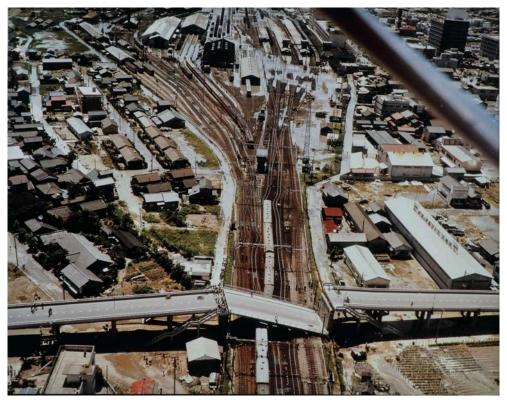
Damage of railway overpass bridge (2) (still photo taken by Mr. Yuminamochi) 東跨線橋の落下(2)
